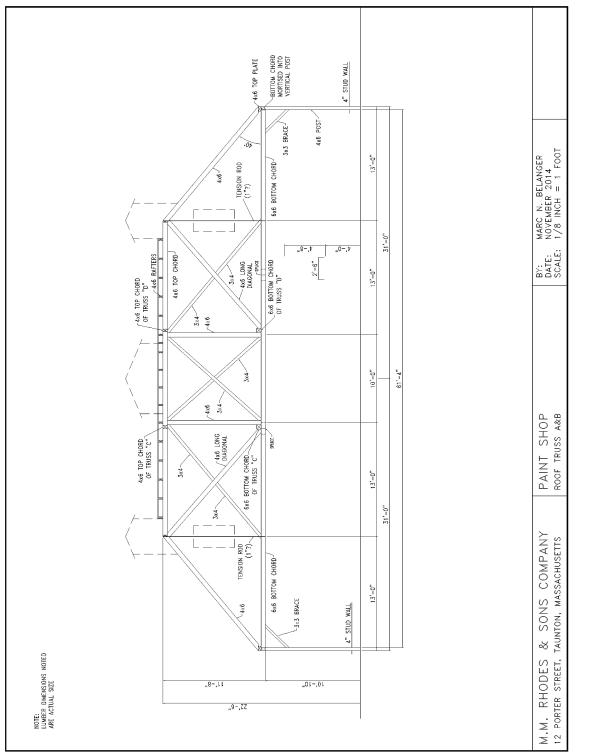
Measured Drawing. Paint Shop Roof Framing, Truss A & B.
